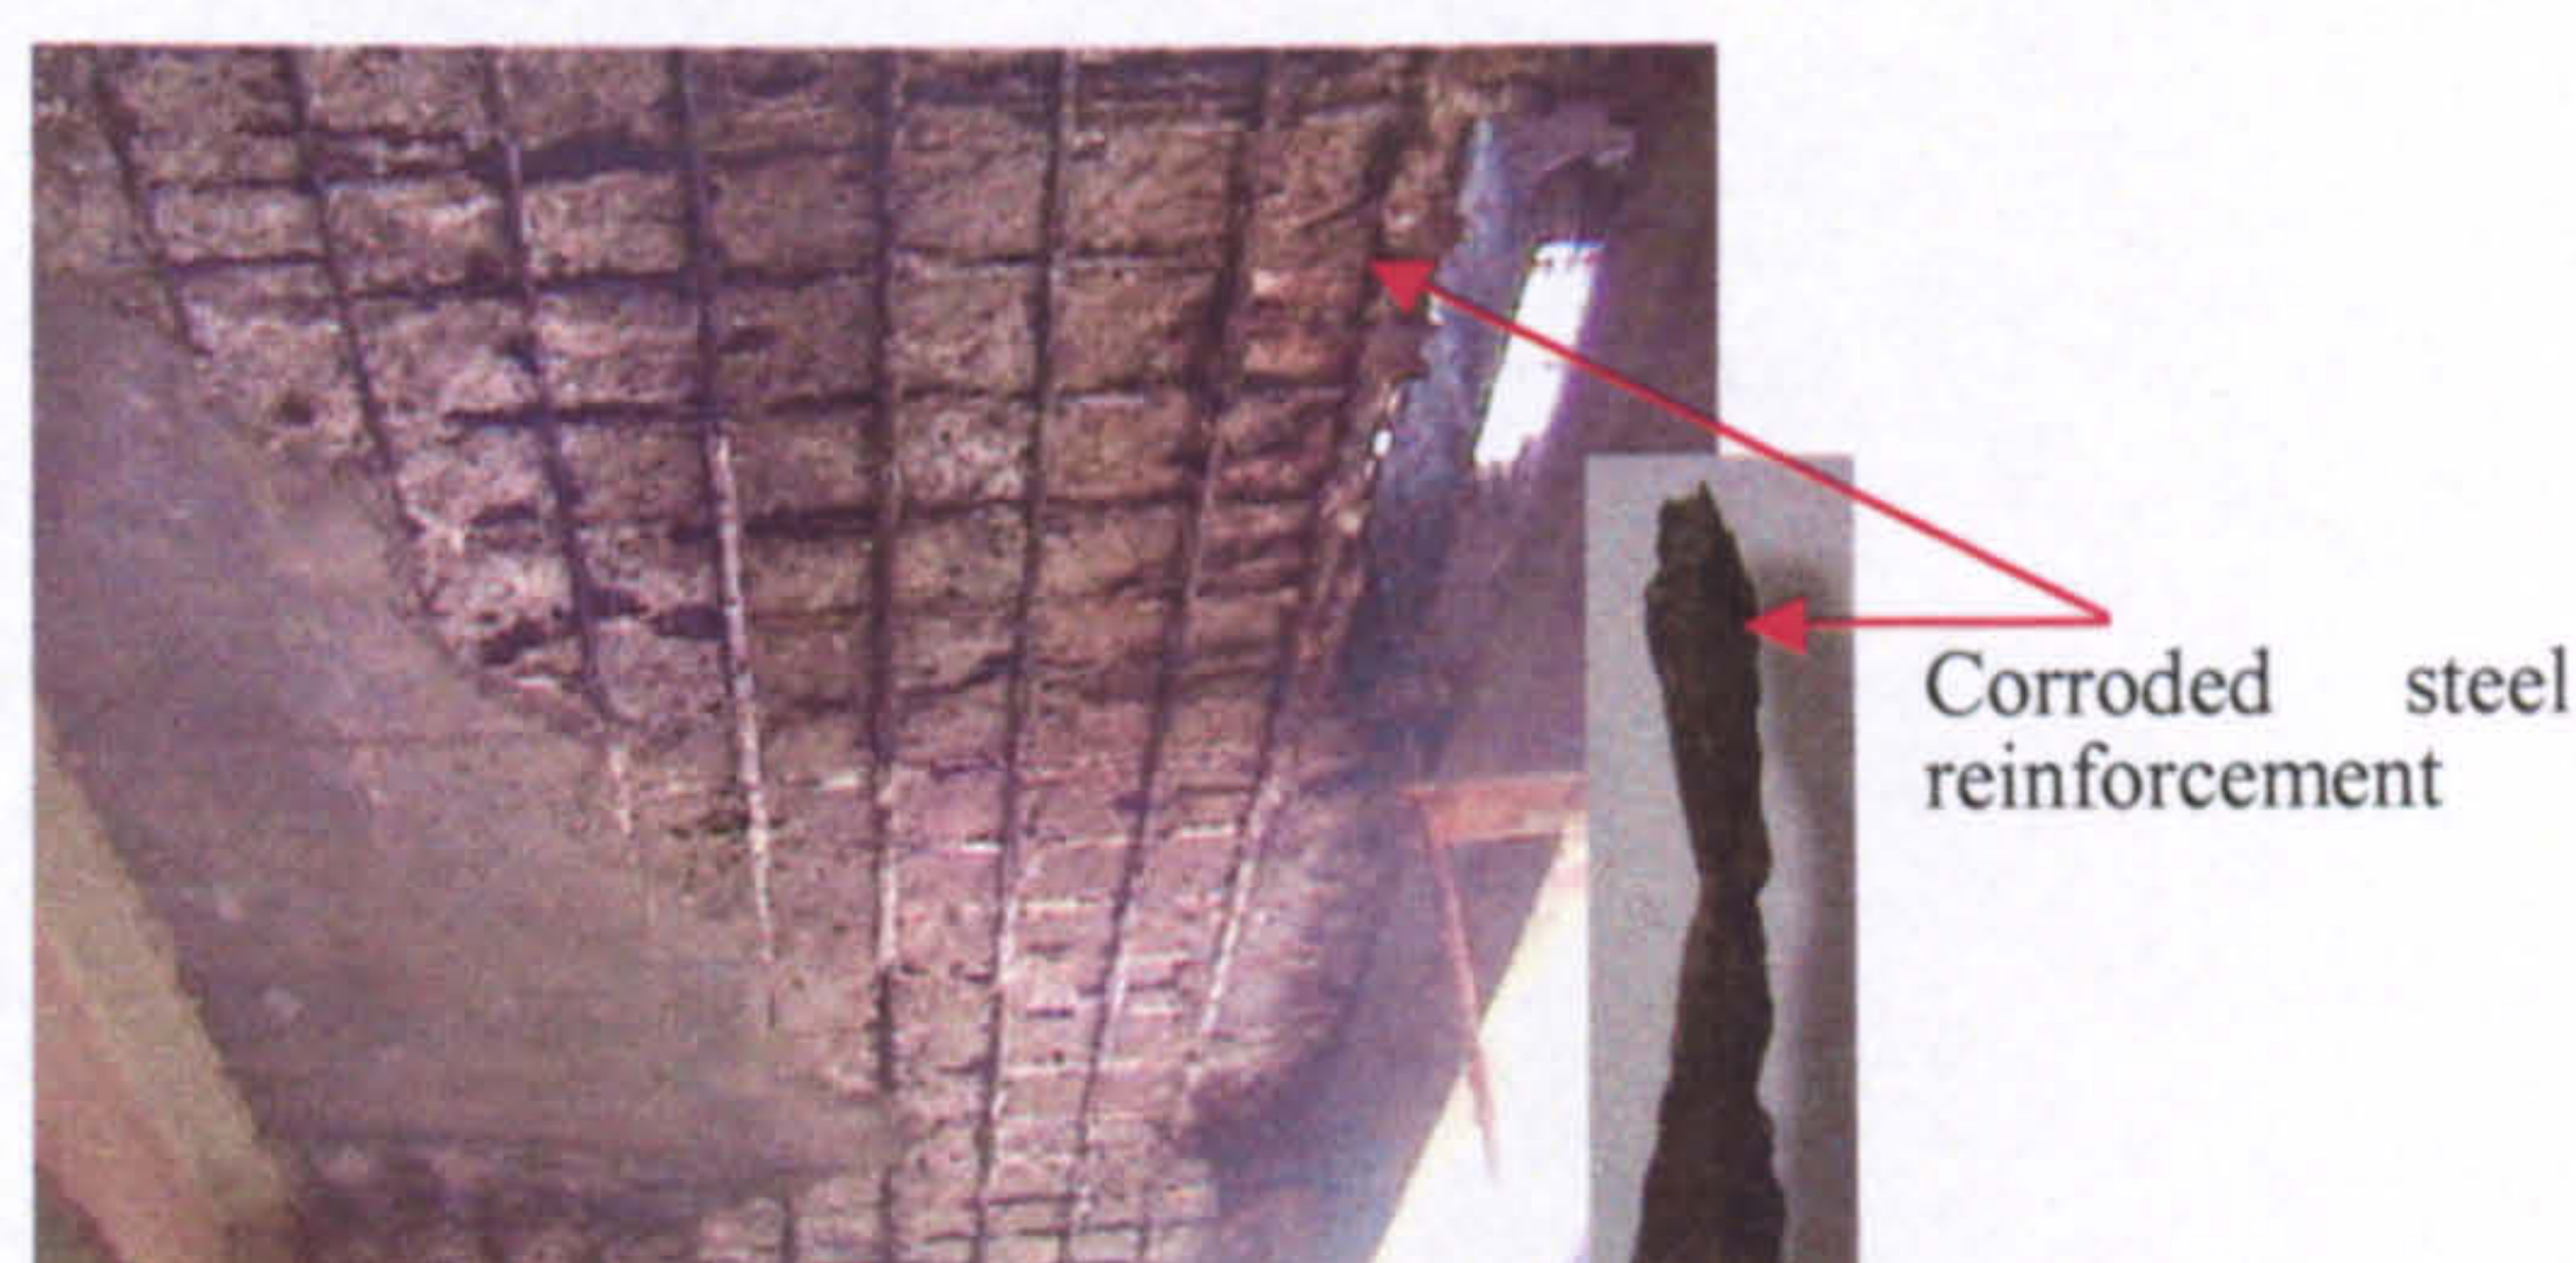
Corrosion of steel reinforcement on the soffit of a reinforced concrete slab.
